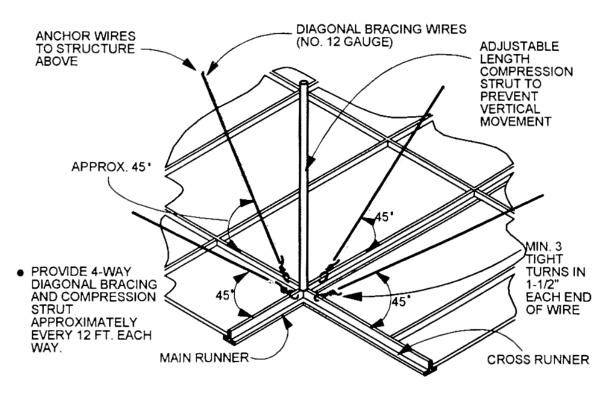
Seismic bracing for suspended T-bar ceiling systems (13-10)
